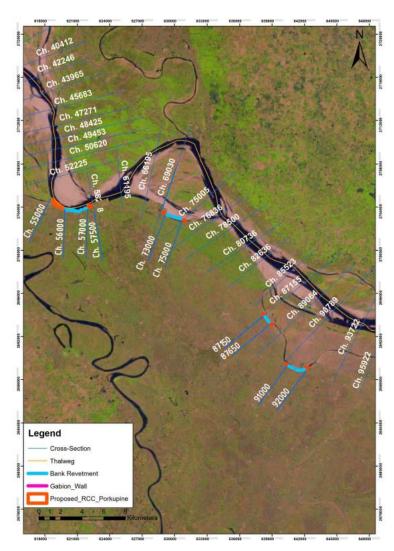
Layout of Proposed River Bank Protection Works in Lalgola-Bhagwangola reach of Ganga-Padma River System
